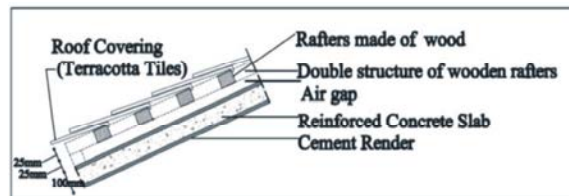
Schematic section of sloped RC roof with roof shading of clay tiles
